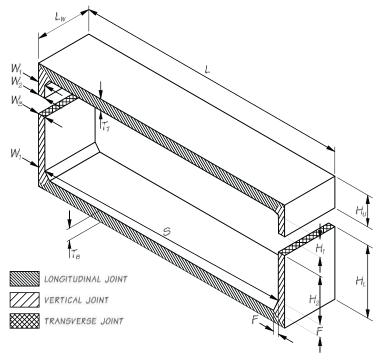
Details of the Washington State Department of Transportation standard precast concrete split-box unit. Joints are designed to carry the applied horizontal and vertical forces, and they are formed so that they can be assembled to transmit those forces and provide joint tightness. All Photos and Figures: Washington State Department of Transportation.
